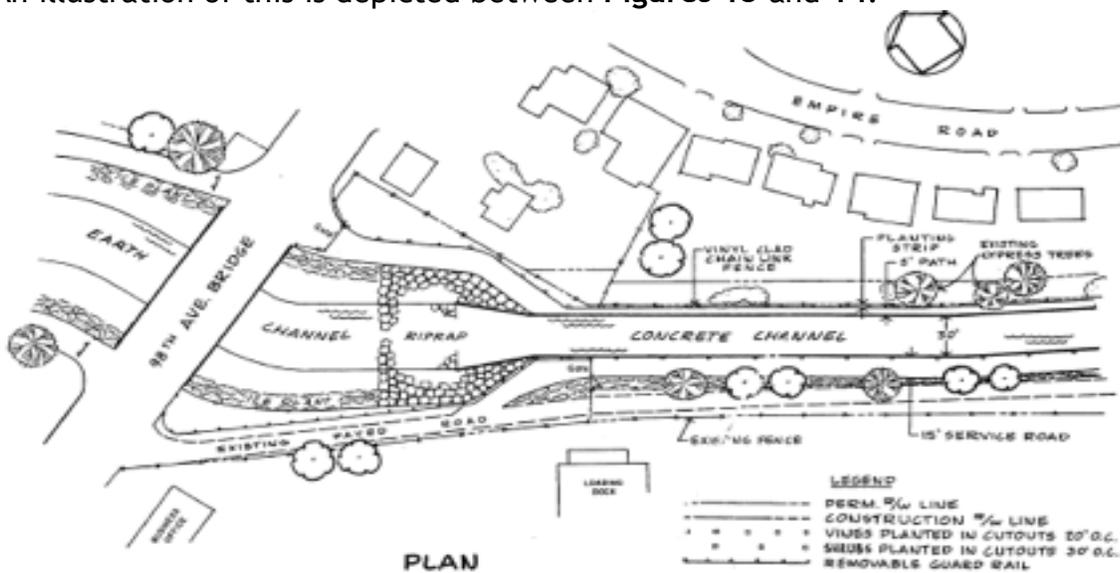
Plan view of original schematic for concrete channel above 98th Ave
